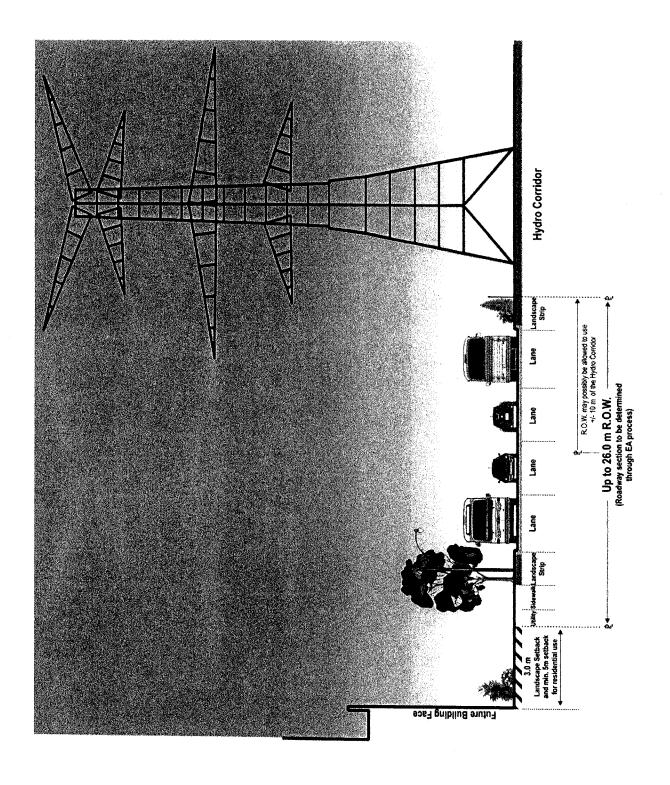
STEELES AVENUE RIGHT-OF-WAY AND STREETSCAPE
